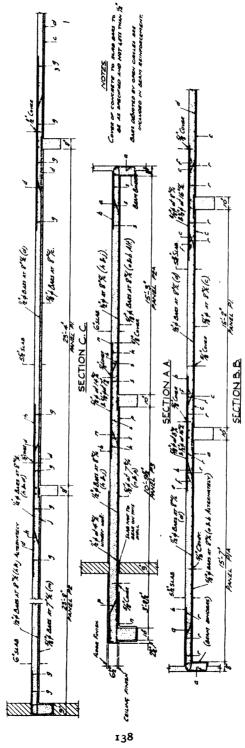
SECTIONS THROUGH SLAB SPANNING IN TWO DIRECTIONS.
